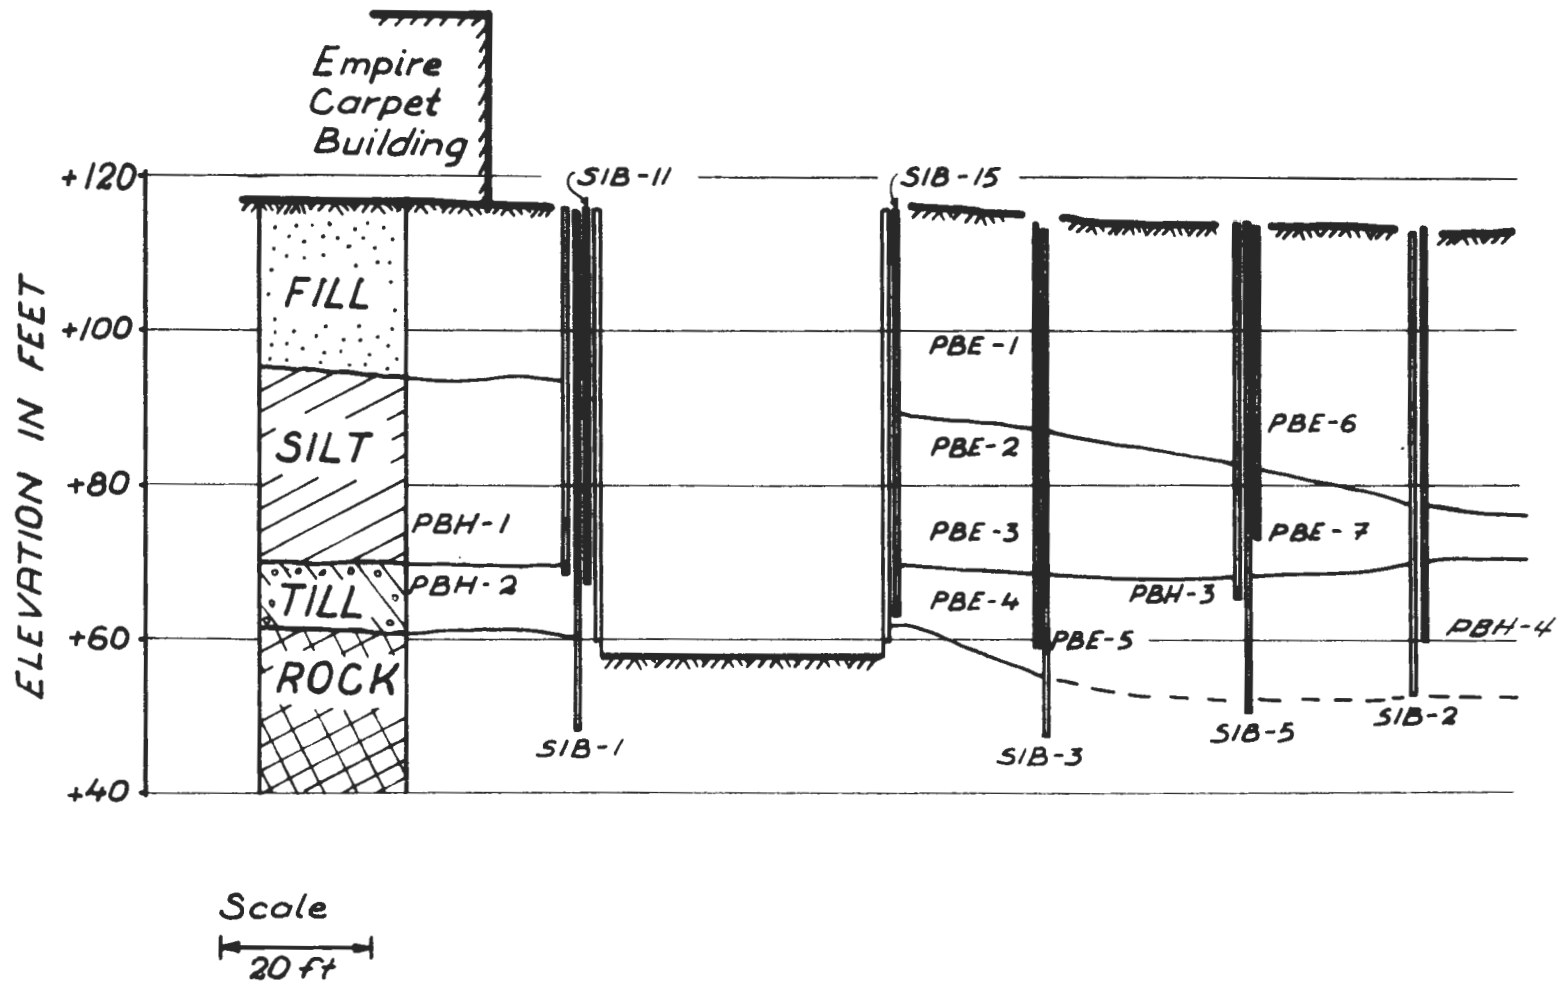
SECTION 11 LOOKING NORTH - TEST SECTION B
